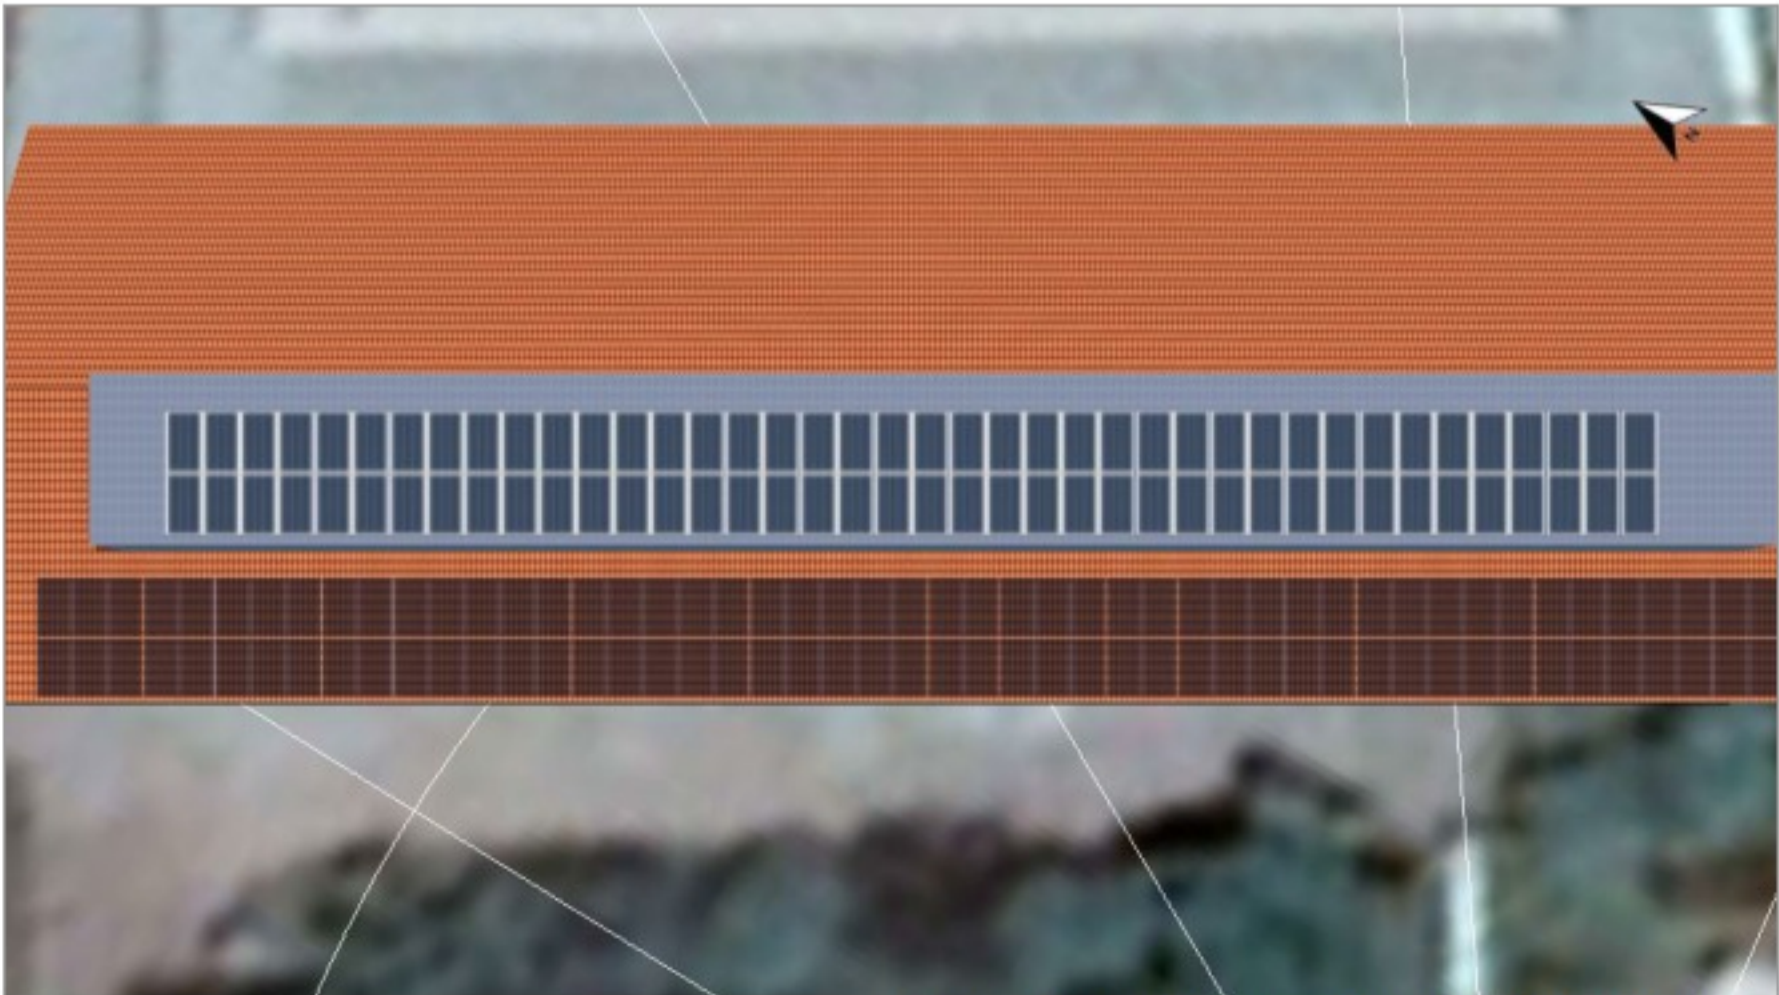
Module Area - Saw Tooth Roof 01-Roof Area Southwest
